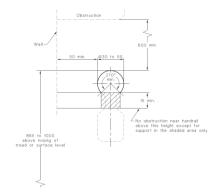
Handrail Details - Section 10.3 and 12 of AS1428.1-2009
